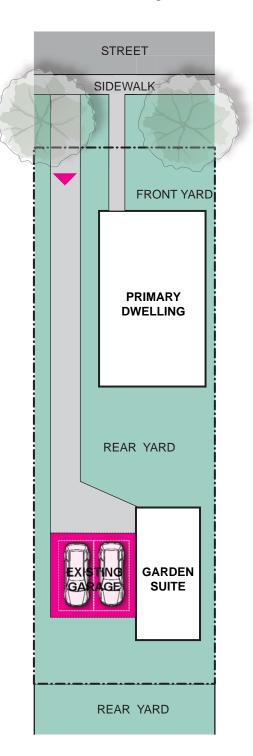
GARDEN SUITES - LOCATION OF PARKING AND ACCESS
